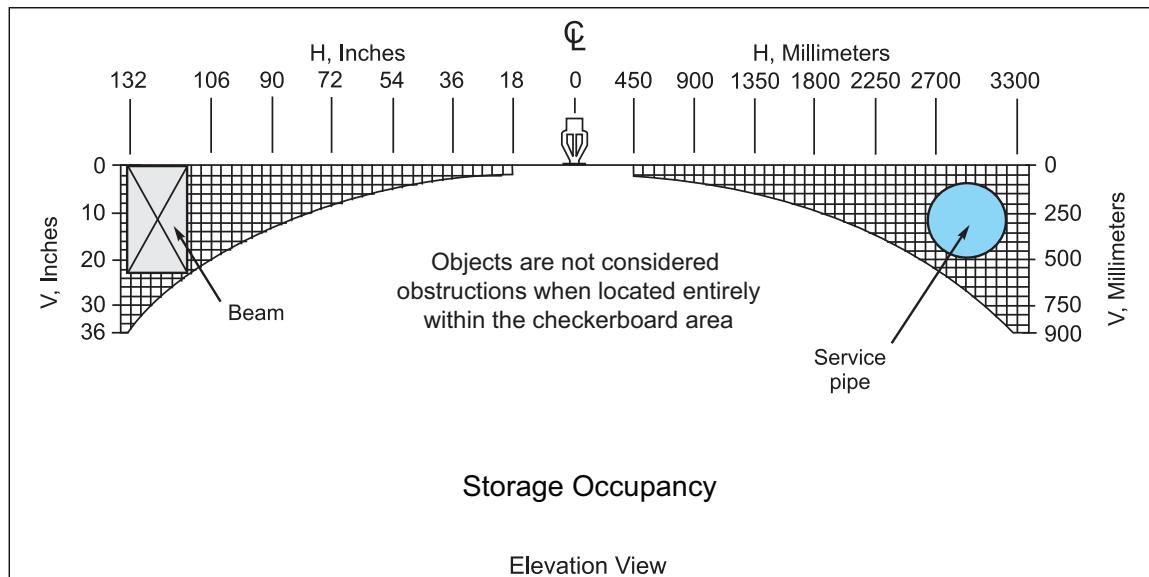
(b). Objects near ceiling level not considered obstructions to extended-coverage Storage sprinklers
